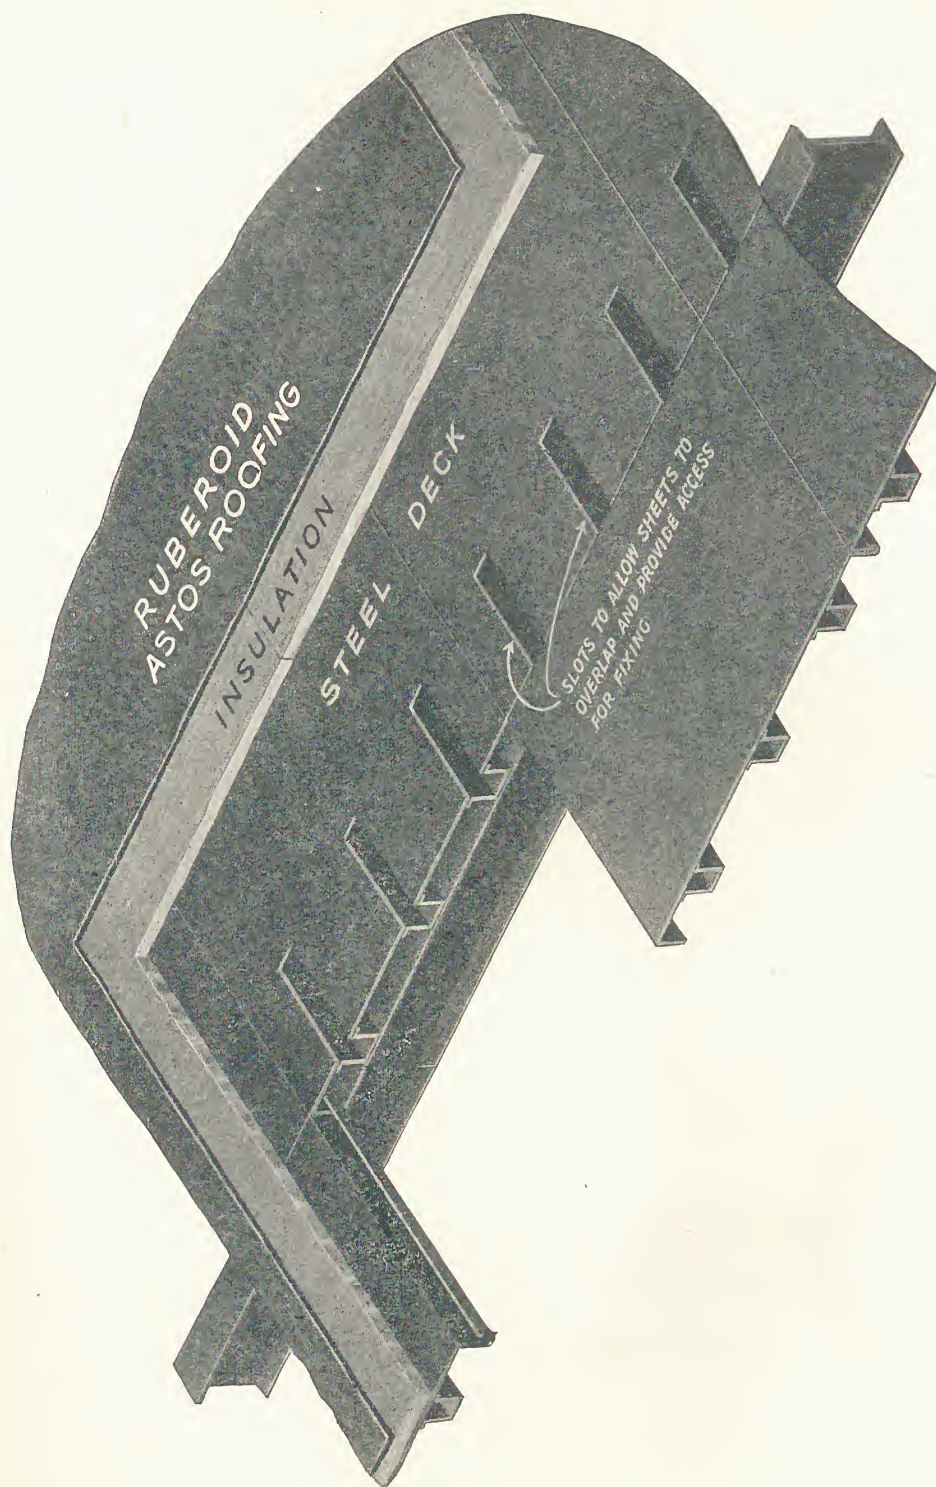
Details of 3-channel Ruberoid Steel Deck cleated to R.S.J.'s with insulation and roof covering.
